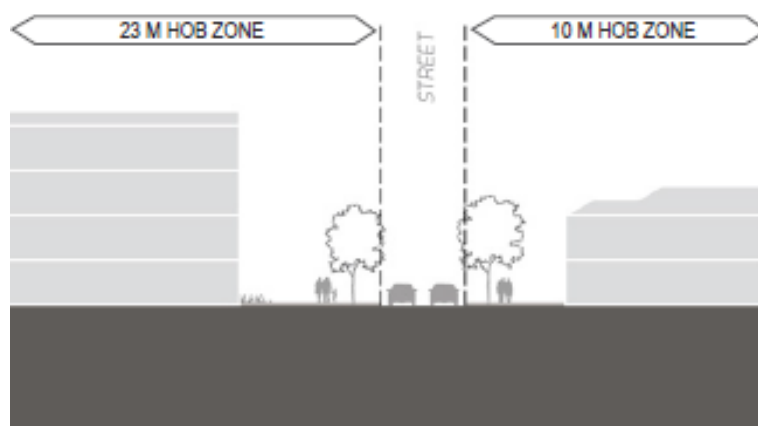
Indicative cross-section showing the form of buildings adjoining the 10m building height zone
